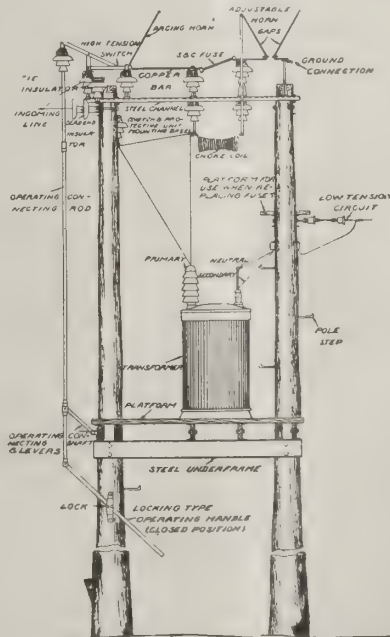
DETAILS OF AN OUTDOOR SUBSTATION.
